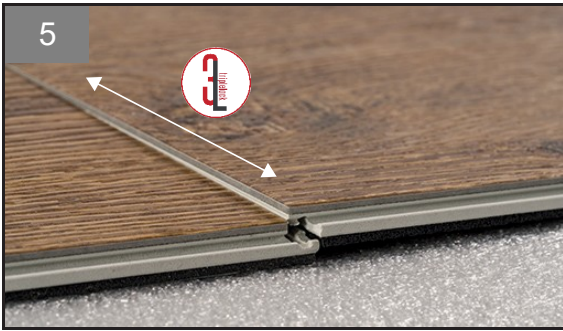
Slide plank 3 to your left until the short side is in contact with the short side of plank 1. Drop the short side of plank 3 onto the short side of plank 1 making sure that there is no gap between the short side of plank 1 and plank 3.
